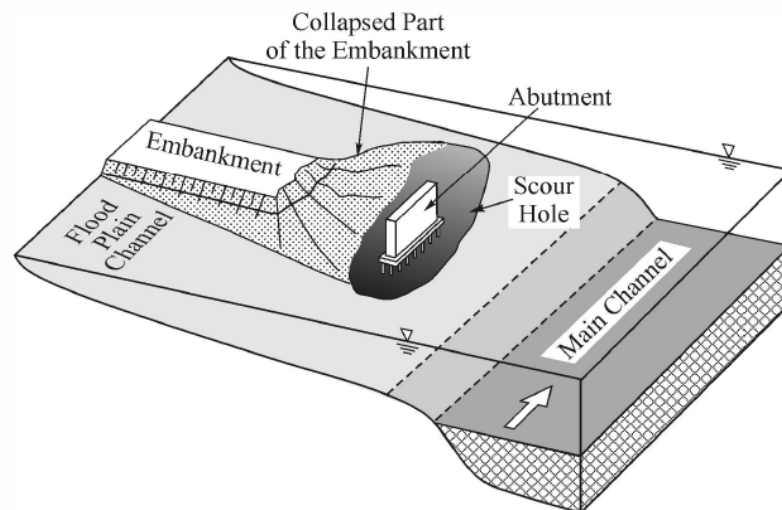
Abutment scour resulting in embankment failure by collapse due to geotechnical instability.
